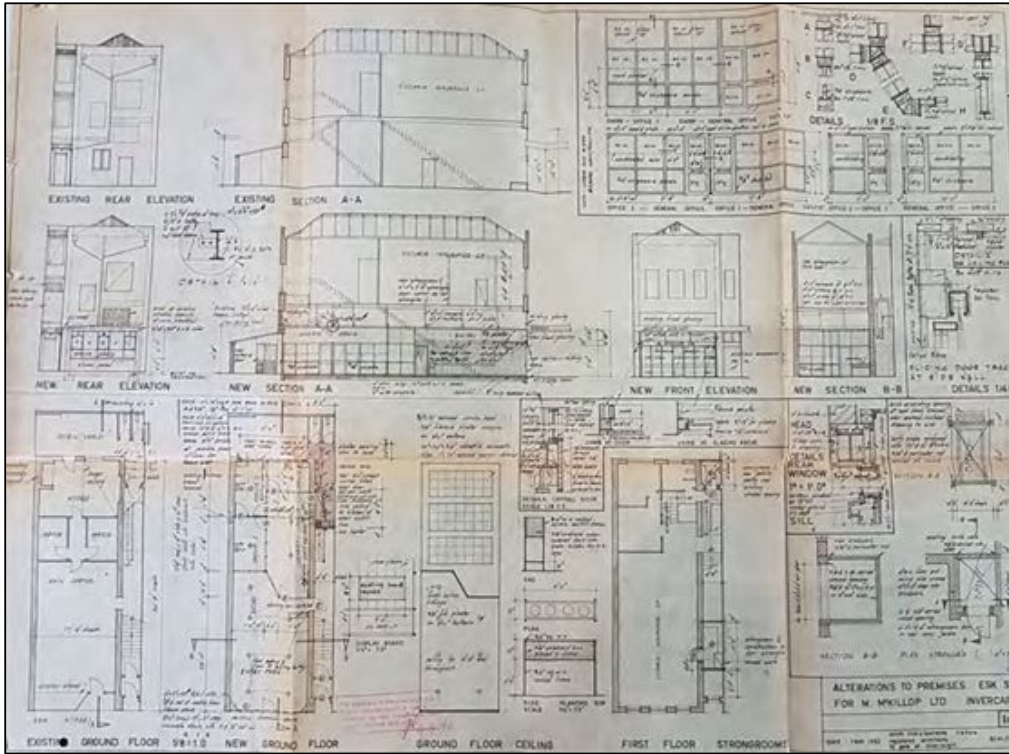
Plans showing 1962 alterations to 18 Esk Street.
